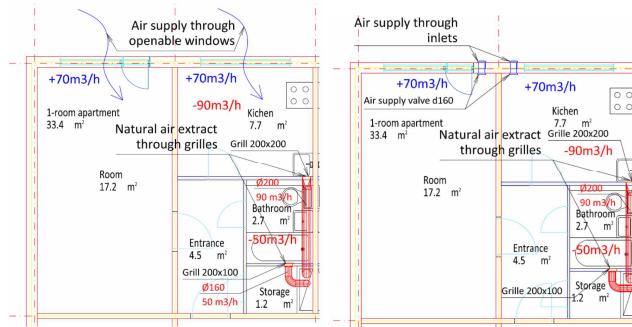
Natural ventilation system through openable windows and exhaust (left); Natural ventilation system through air inlets and exhaust (right)
